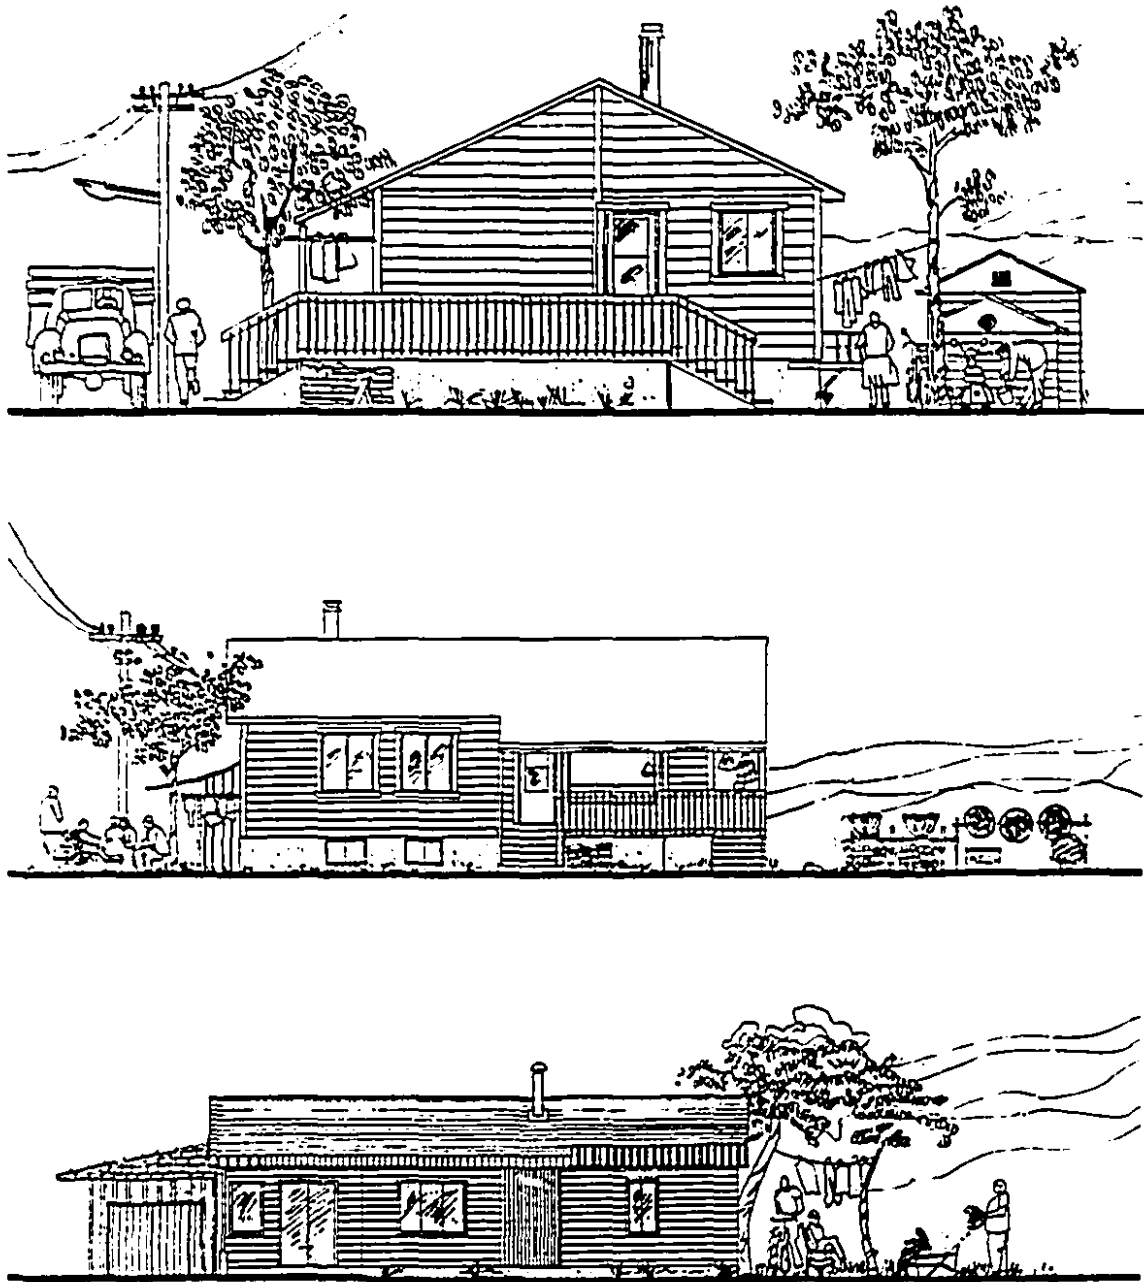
Elevations of typical houses in Mistissini reserve showing varieties of activities that take place in entrances, porches, terraces and yards (author's sketch based on observations and drawings of the CHC, September 1993).
